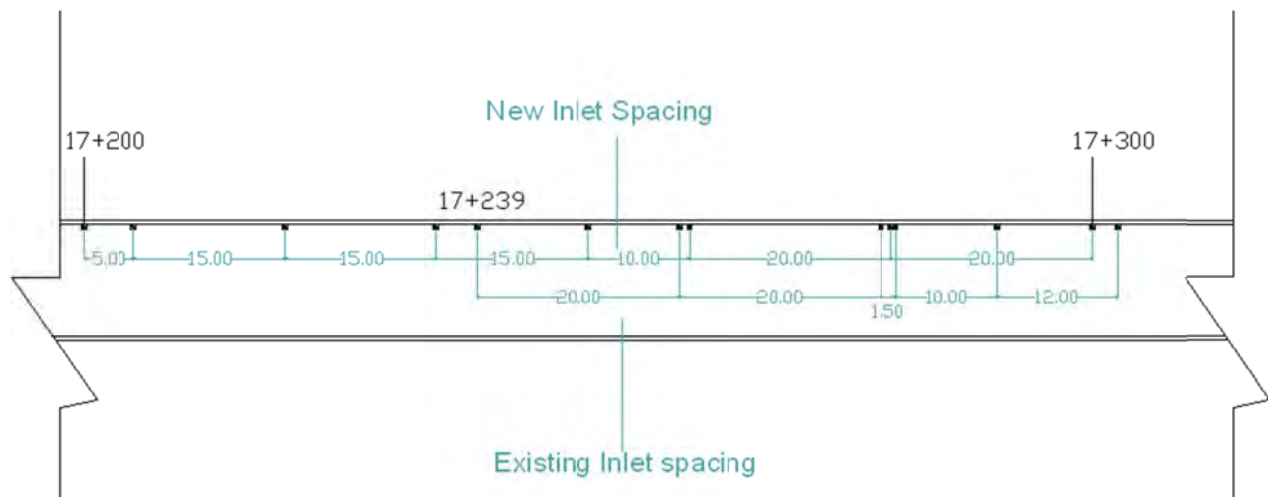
Existing and new computed inlet spacing at Ring road (Total – Zenebework).
